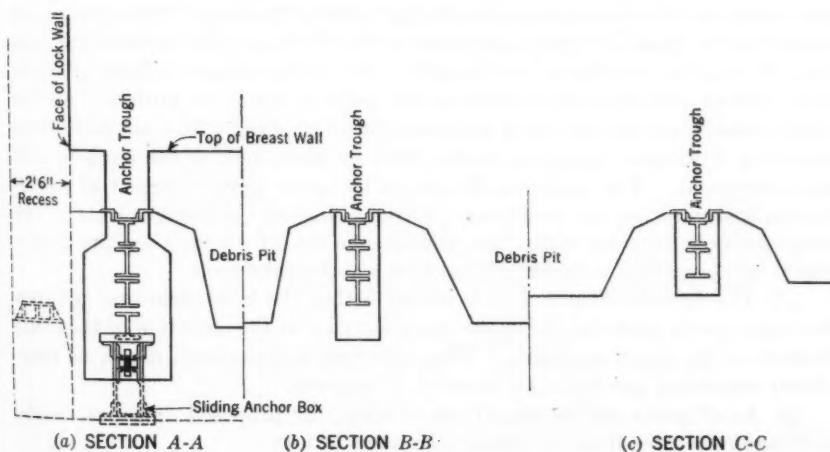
SECTIONS A-A, B-B, AND C-C, FIG. 2, SHOWING ANCHORS IN THE LOWERED POSITION
